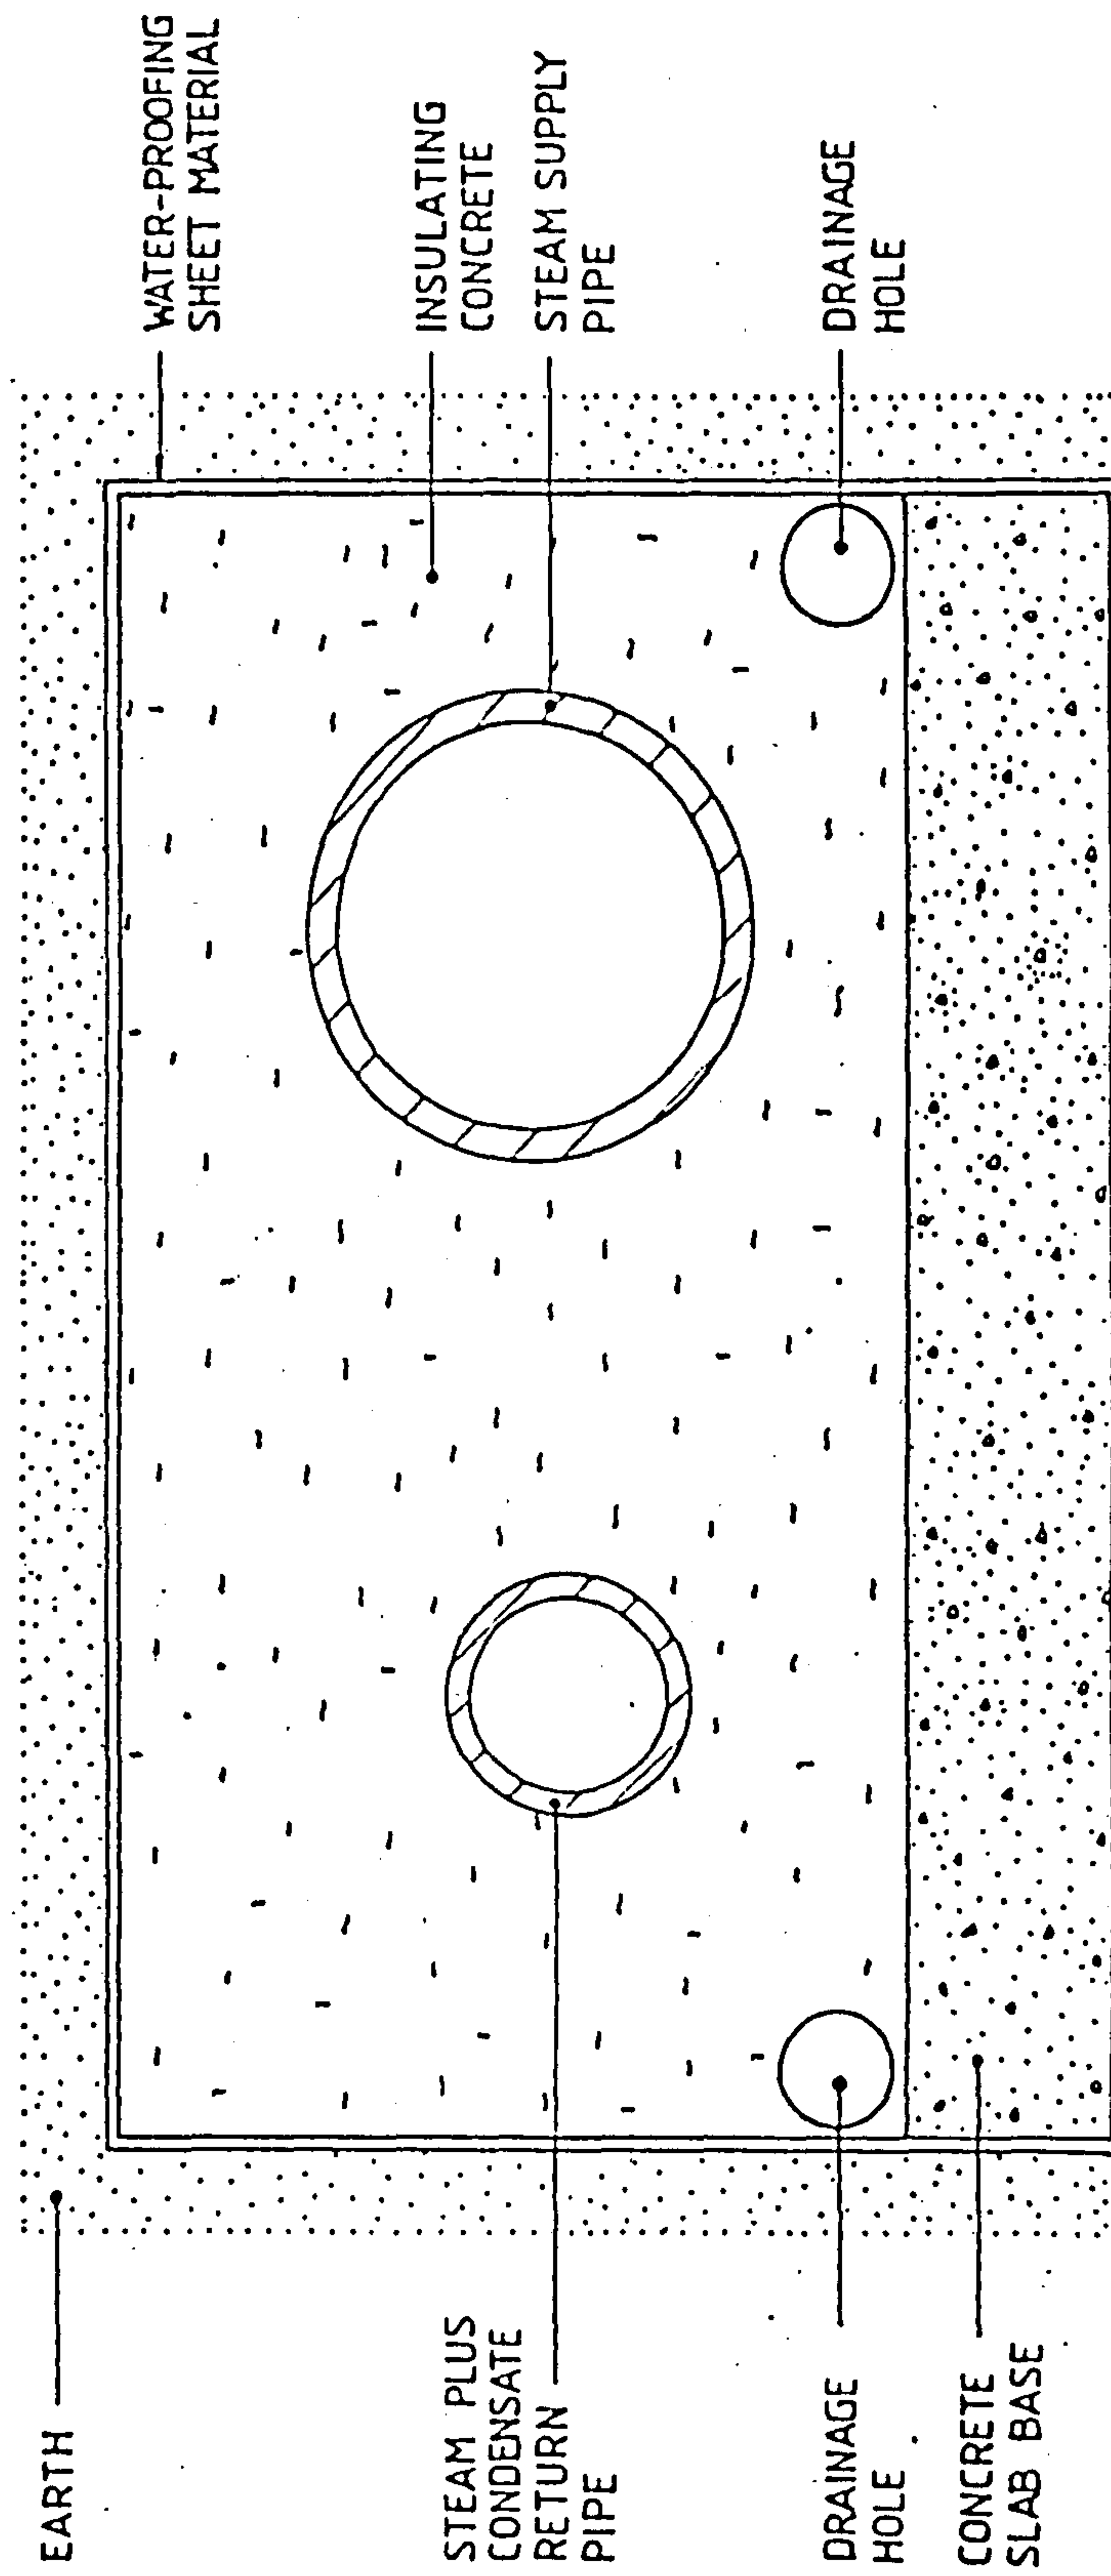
Schematic cross-section through an insulating-concrete envelope system for supply and return pipelines (60).
